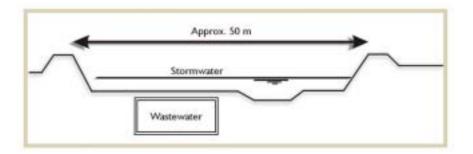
Cross Section of Rio Juan Amarillo/Salitre Box Culvert System
